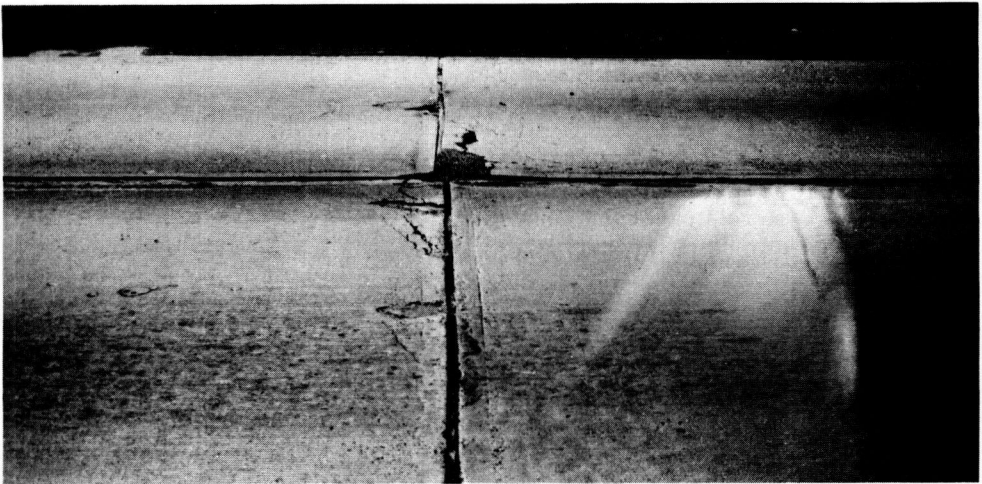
A "blow-up" in a concrete pavement. Photograph taken a few minutes after pavement broke. Loose material is still lying on the surface.
